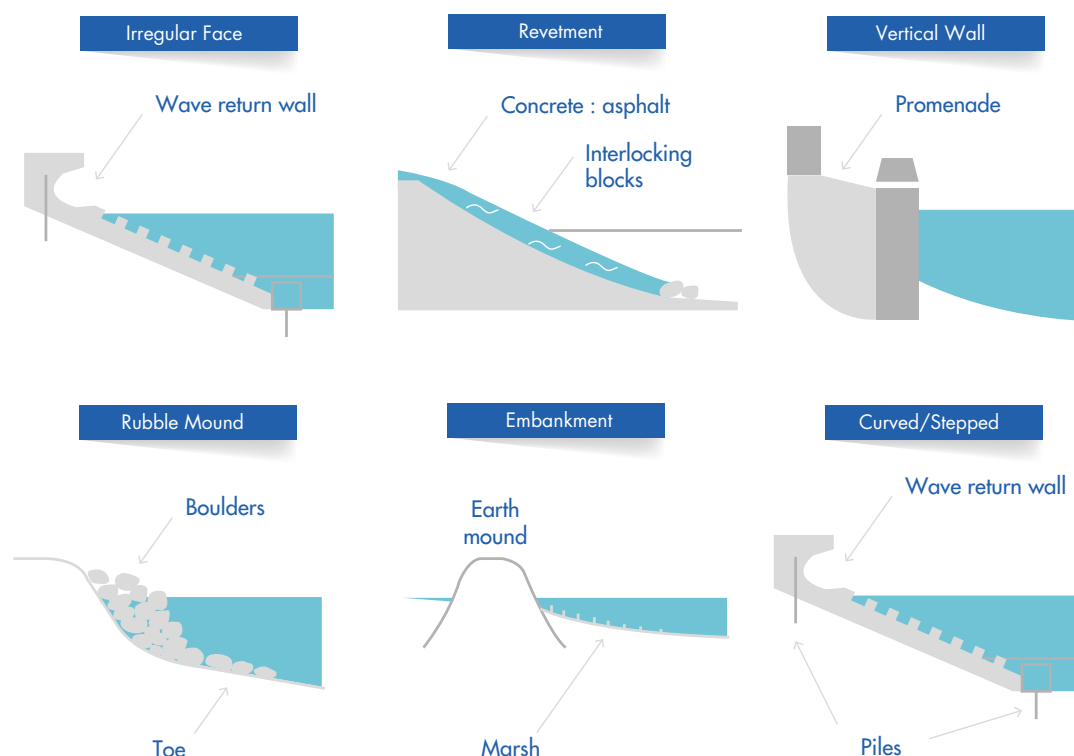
Variation in design type of sea walls. Hard, concrete structures are typically replaced by revetments and embankment-type structures in more sheltered environments (Source: Adapted from French 2001).
